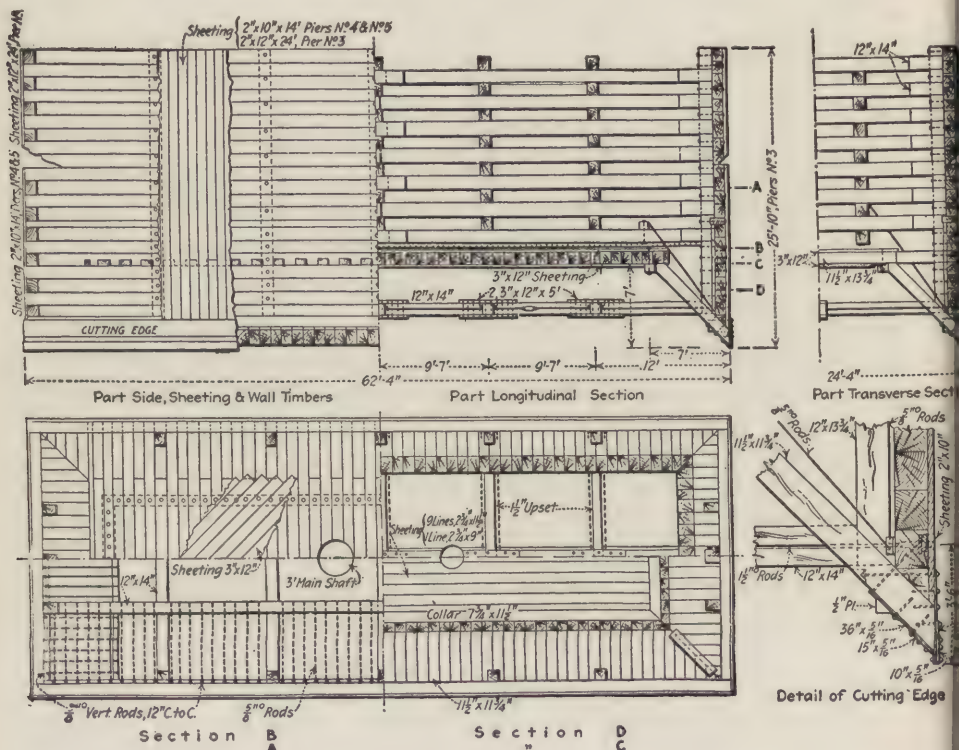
Details of Pneumatic Caisson for the Union Pacific R. R. Bridge at St. Joseph.
